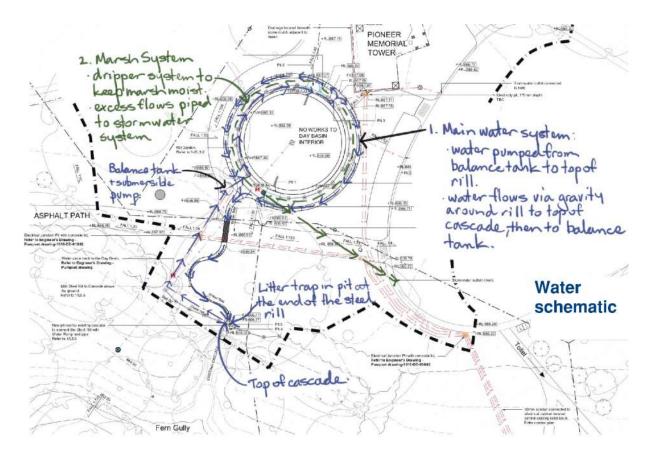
Proposed water flow from the rill to top of the cascade, excerpt of GbLA sketch plan (Source: GbLA, 2023)
